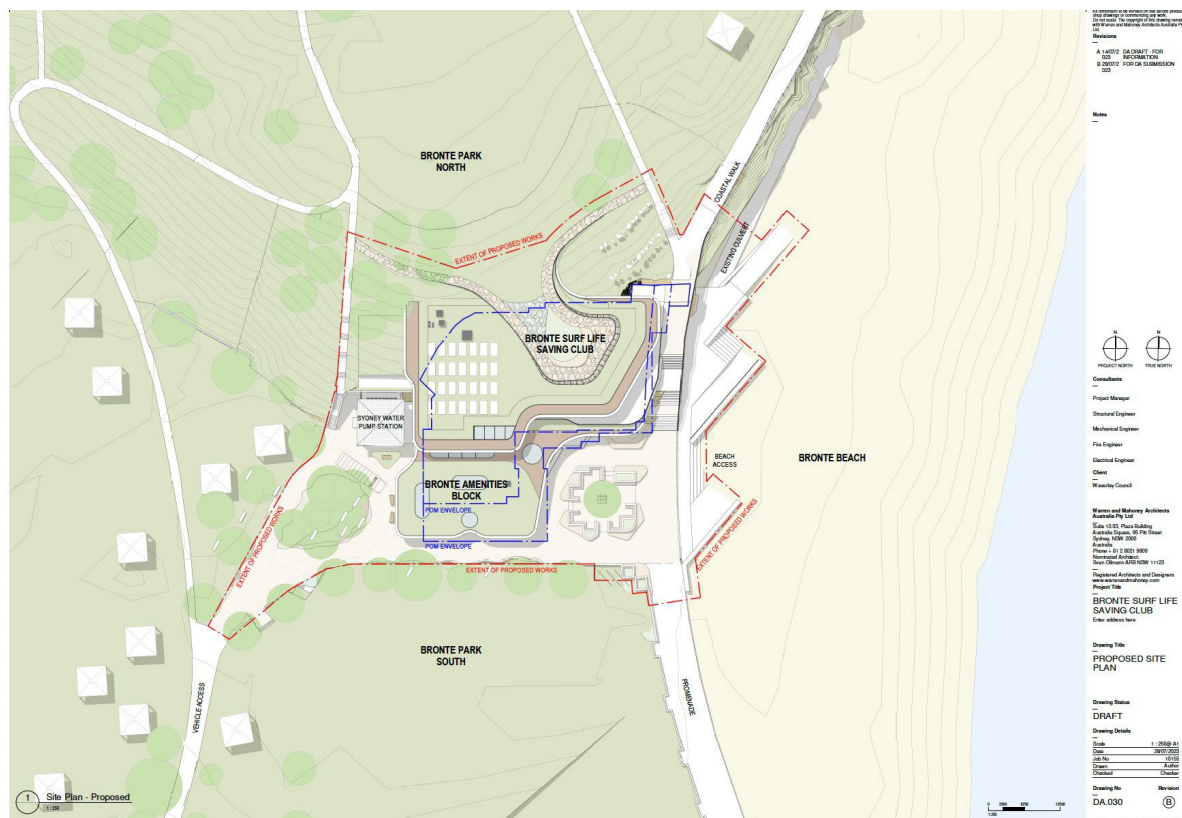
Waverley Council and BSLSC Facilities Site Plan
